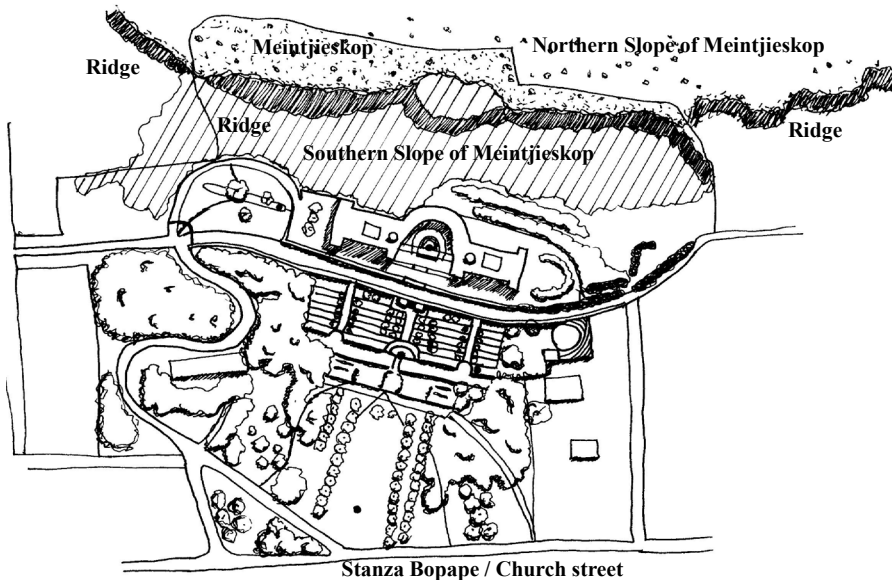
Site analysis - Union Buildings site conditions(Author 2021)
